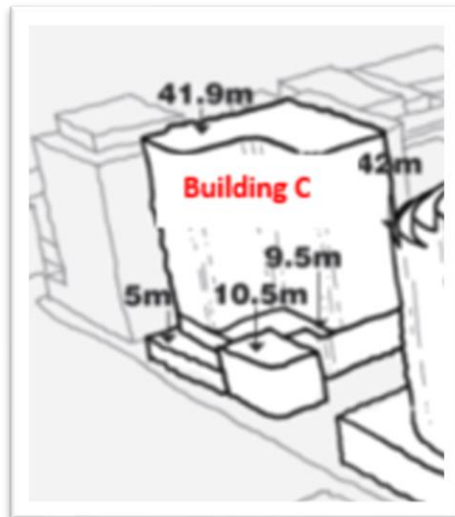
Proposed heights of Building C. Source: Development Plan (2023)
